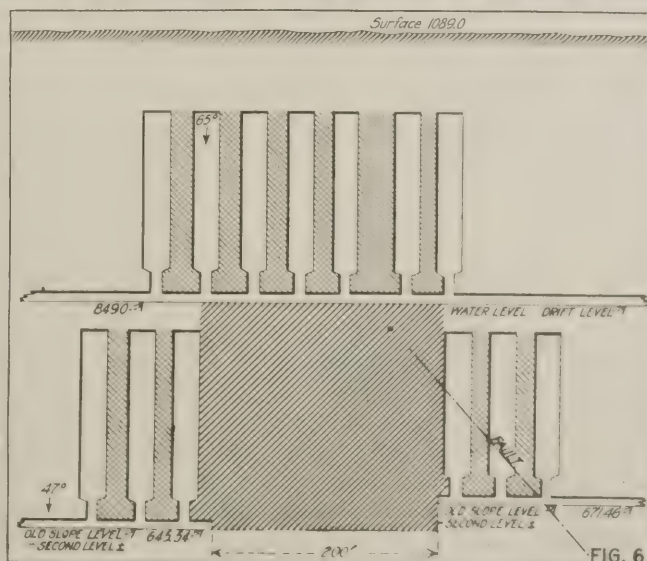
LONGITUDINAL SECTION OF A BARRIER PILLAR LEFT BETWEEN SLOPES
